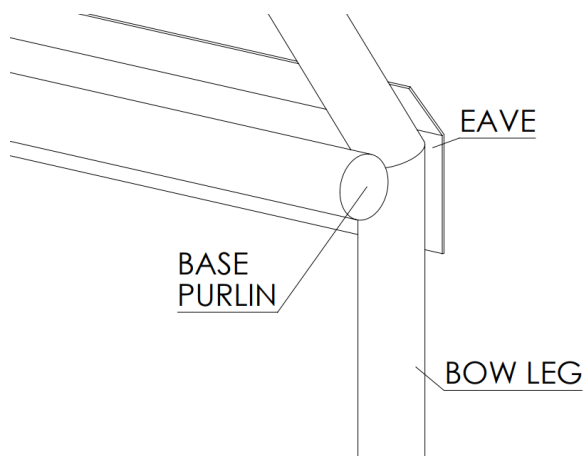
Eaves will be placed over the lowest arch of the bow and base purlin.
